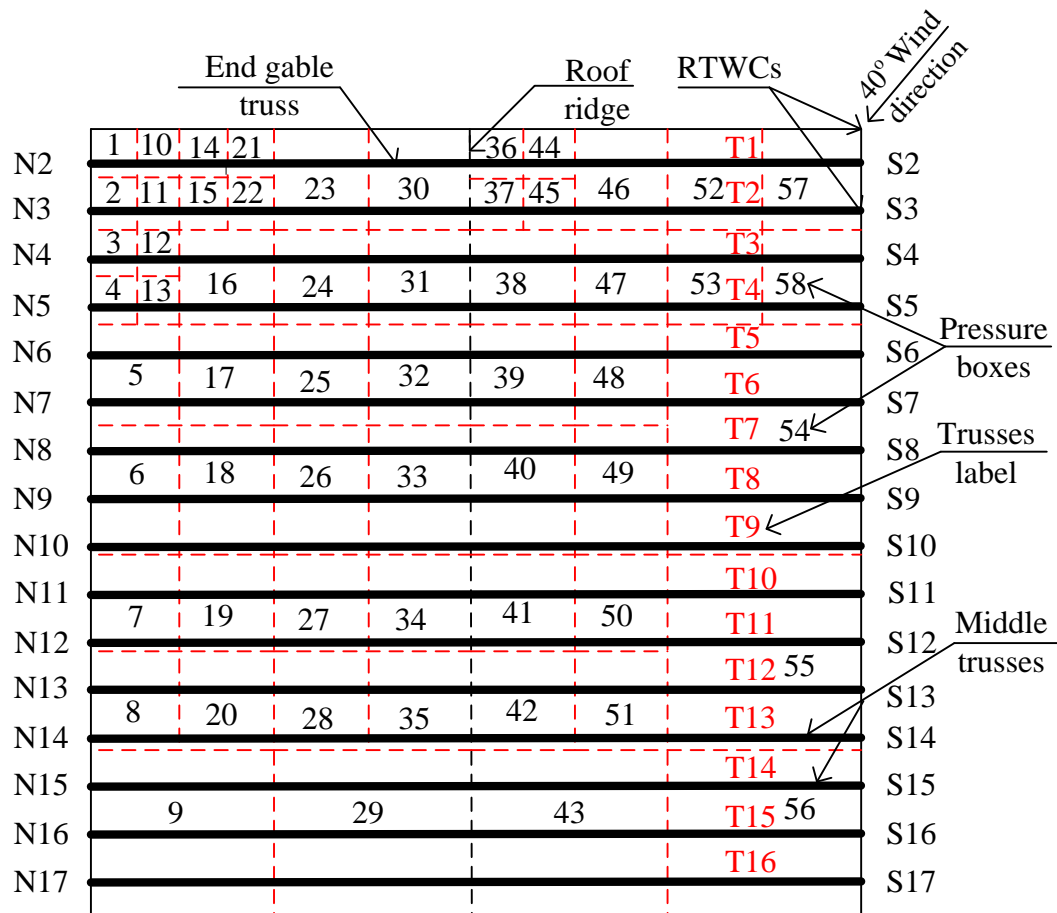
Layout of the numerical model proposed by Jacklin (2013).
